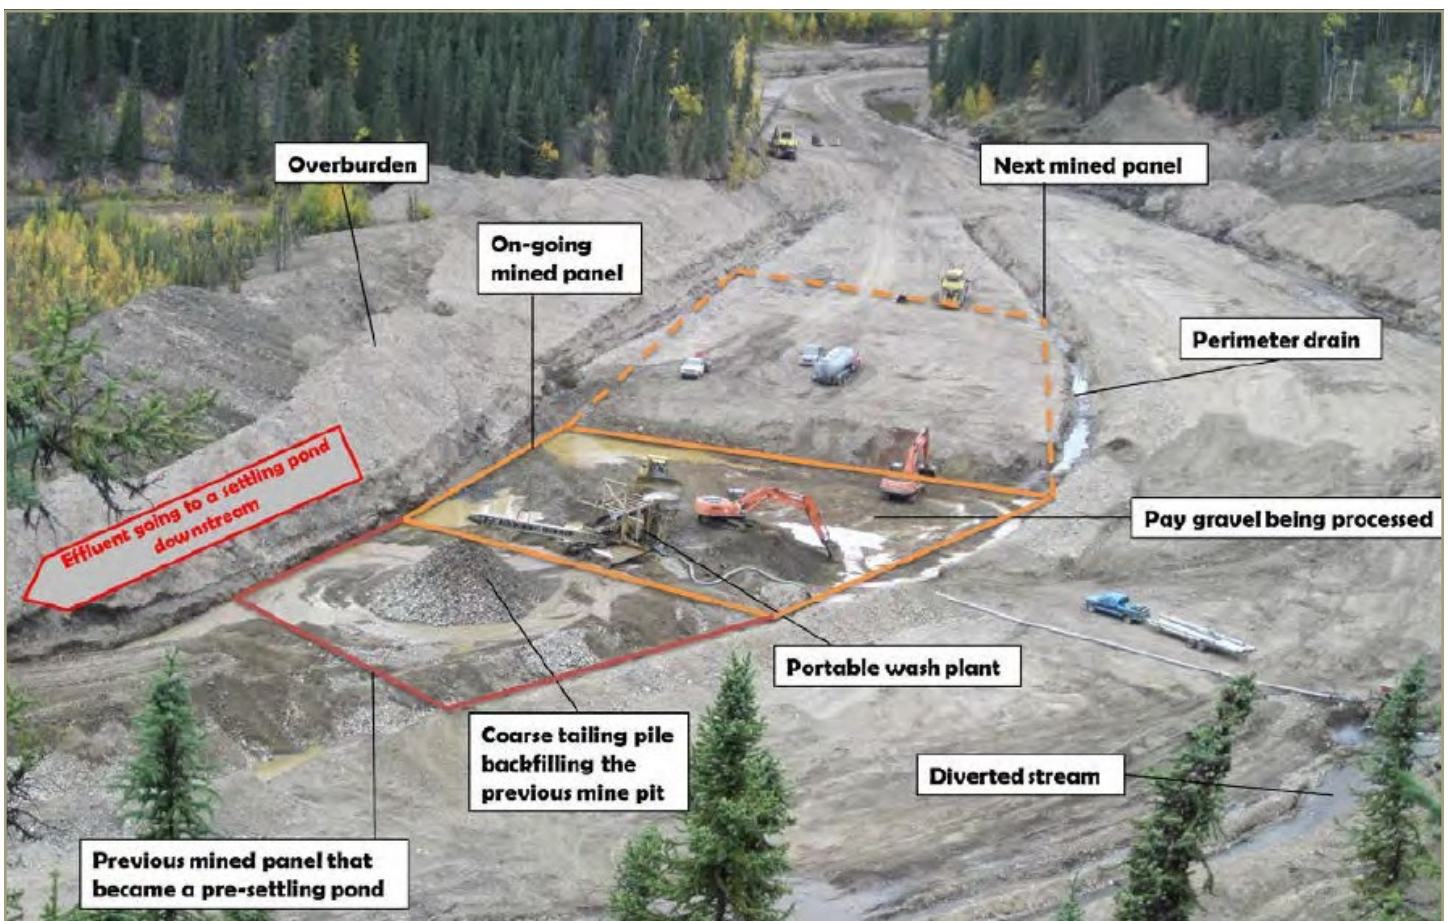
Example of a rolling footprint from [Chevreux and Clarkson \(2025\)](#). Please note: the “perimeter drain” is important to dewater the advancing mining cut. It collects ground water, meteoric water, and melt water and directs it to the bypass ditch using discharge controls (in accordance with the mine’s APDES).
